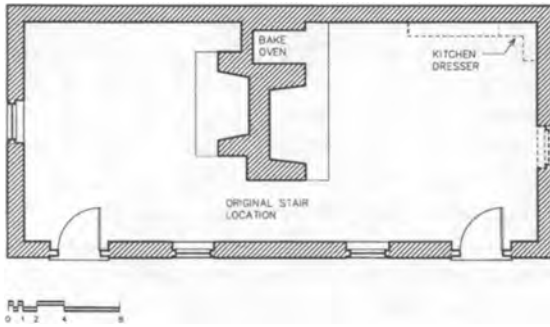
Heyward-Washington house kitchen-quarter, Church Street—ground floor plan.
